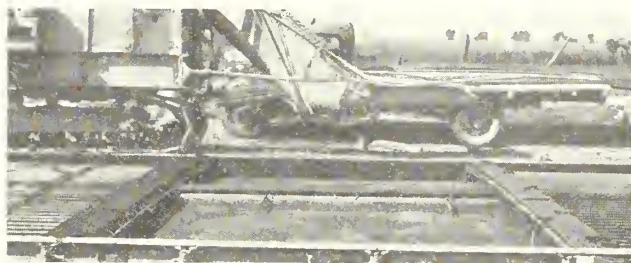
TYPE II JOINT IN PLACE ON THE SUBGRADE PREPARATORY TO PLACING CONCRETE.
